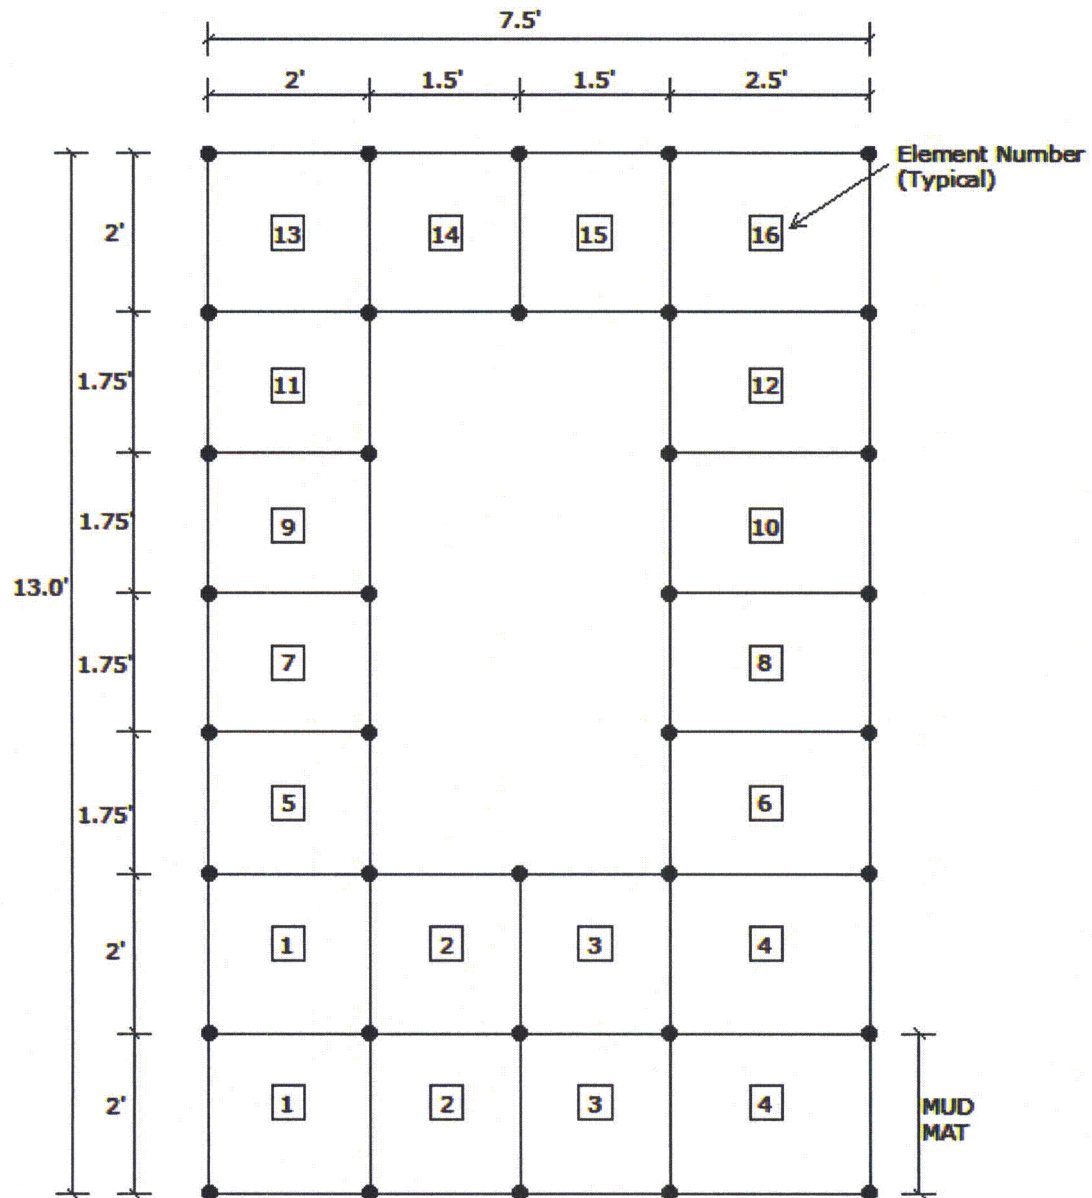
H.7-20: 2D Model for SSI Analysis of a Typical Cross section of DGFOT
